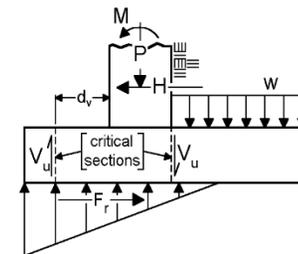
Example of Critical Section for Shear in Footings
